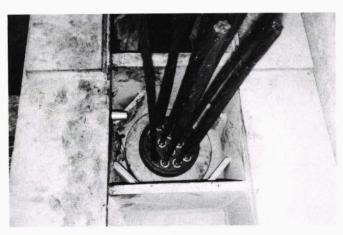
Steel frame placed at end of each beam to anchor new cables.
